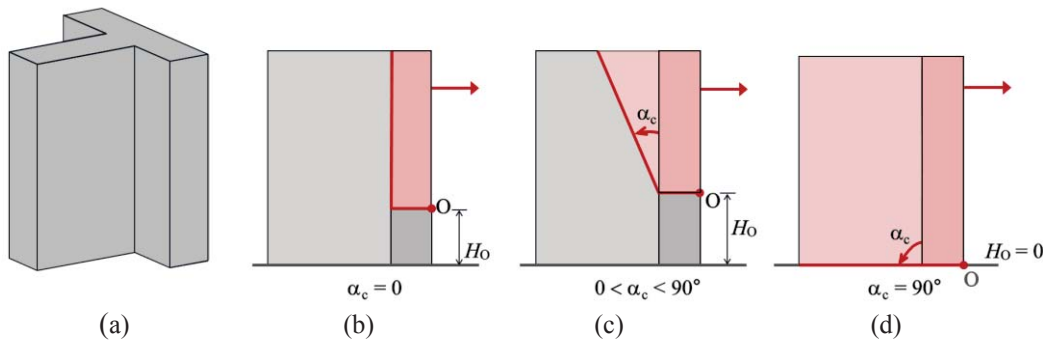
Rocking-sliding failure modes of a T-shaped wall: (a) geometrical configuration, (b) simple and (c) compound rocking of part of the front wall, (d) rocking of the whole T-shaped wall.
